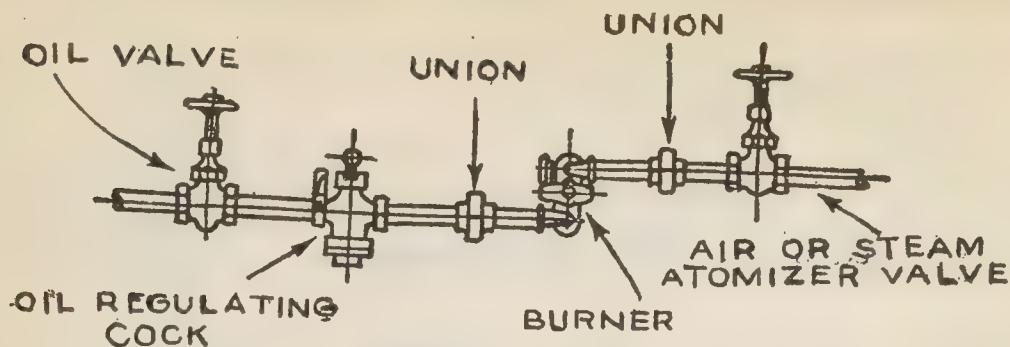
,894.—Correct method of connecting *Best* atomizer valve (air or steam), also regulating cock and oil cut out valve.
